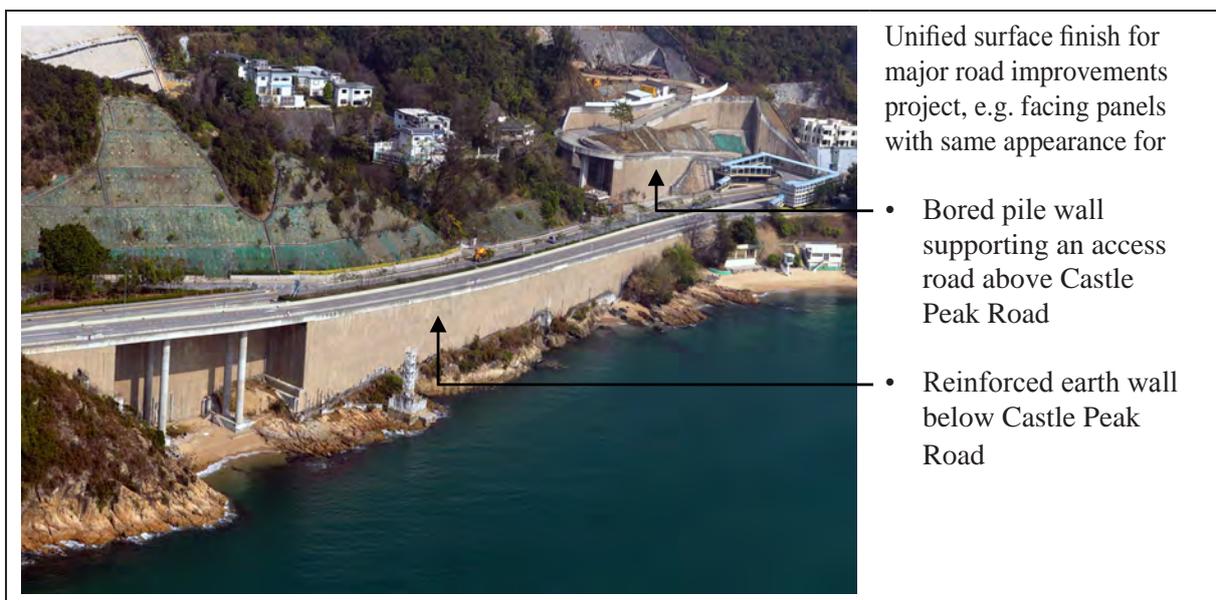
Aerial View of Unified Finish for Retaining Walls
